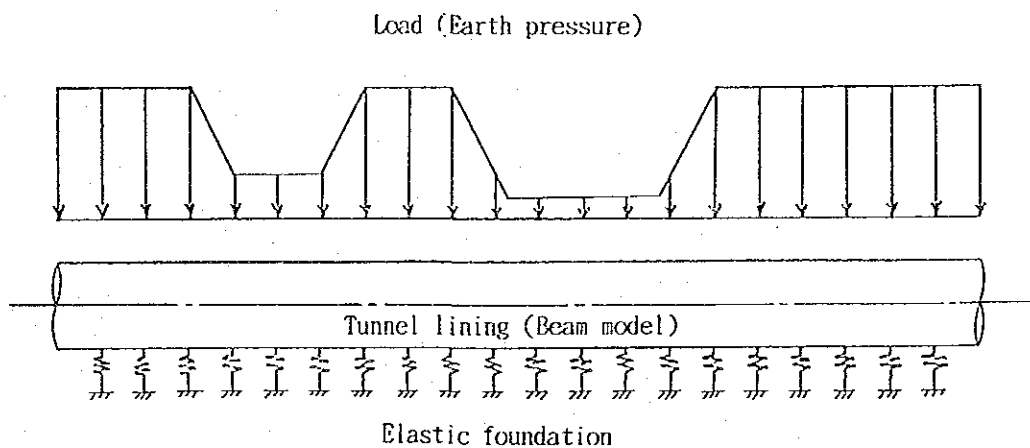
Analytical Beam Model for the Canal Expansion
